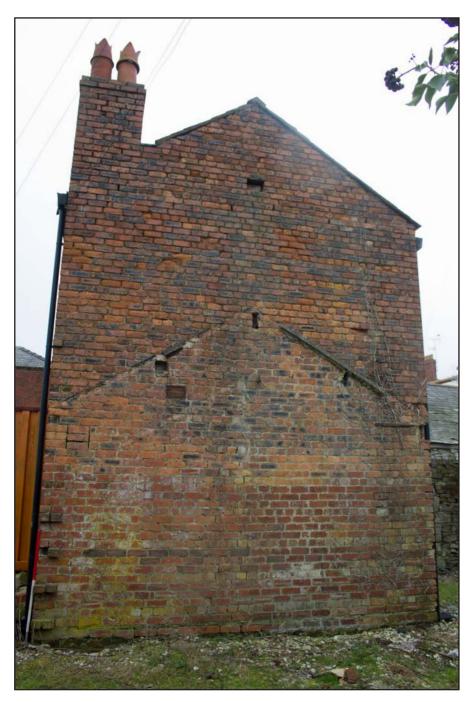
Northwest facing external elevation, from the northwest. Scale 1.0m.
